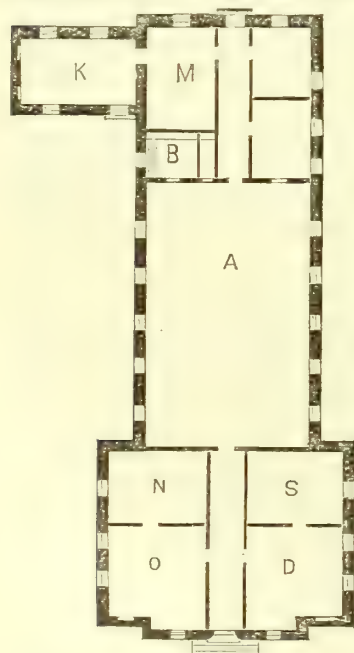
Scale,  $31\frac{1}{2}$  feet to 1 inch. not made to lower; the air space per bed, however, is ample, being 1,040 cubic feet. The wash-room adjoining contains a bath-tub and basins. Situated about 75 feet to the west is a frame building, 40 by 24 by 9 feet, not plastered nor ceiled, and occupied as a ward for colored troops, with a portion partitioned off for a store-room. The ward contains five
